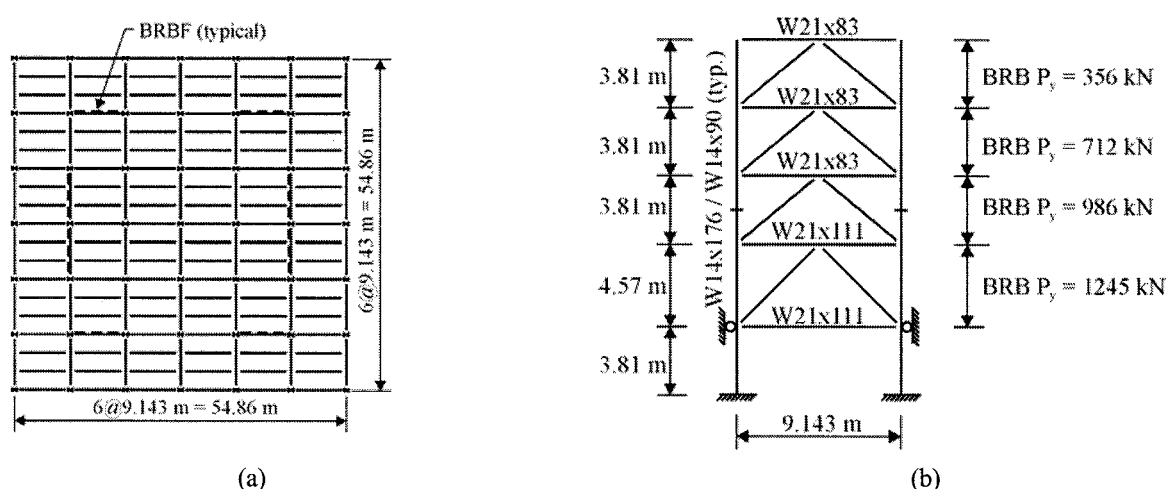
Prototype: (a) building floor plan; (b) frame elevation.
